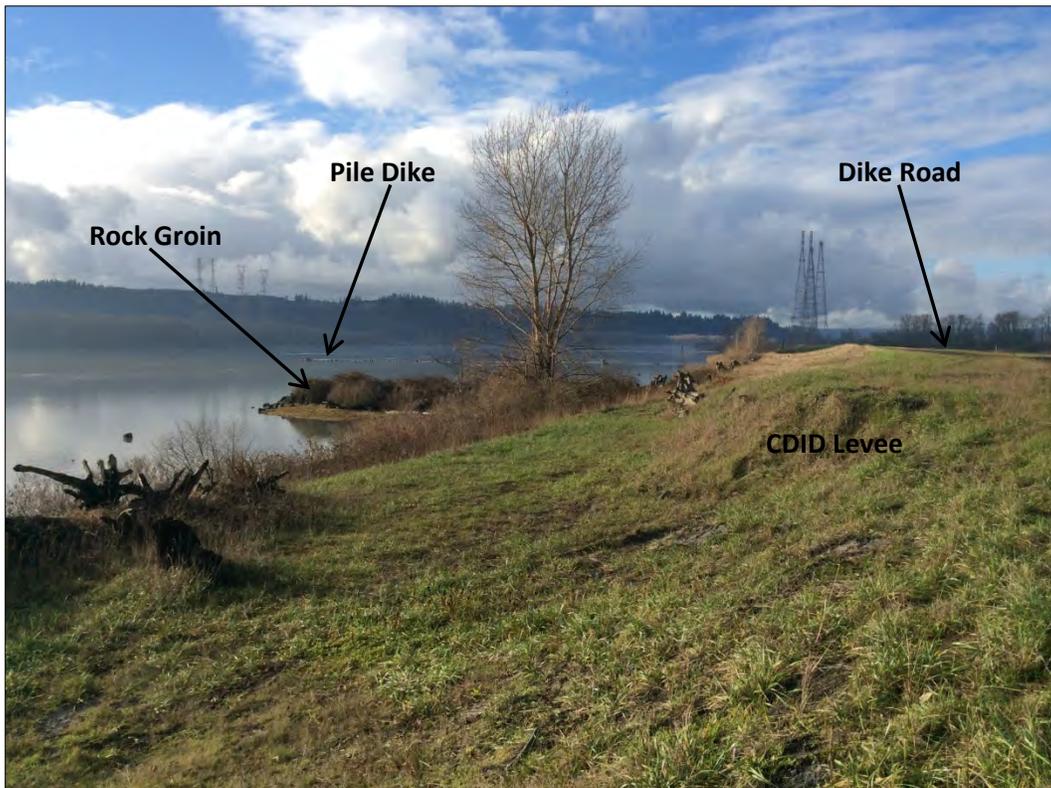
Photo shows typical managed herbaceous vegetation cover type growing on the river side of the CDID Columbia River Levee. Existing rock groin and pile dikes are also visible. (Photo Date: 12/12/2014)
